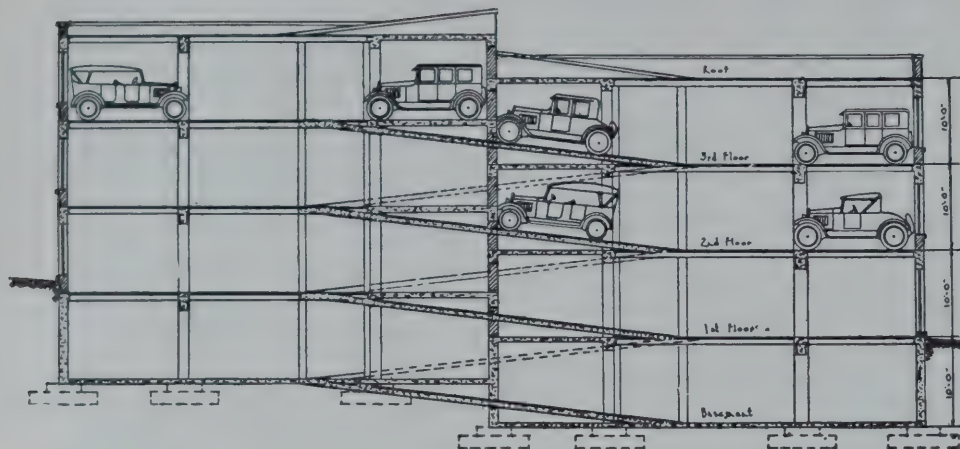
Section through Garage Showing Patent Ramp Design with Staggered Floors
